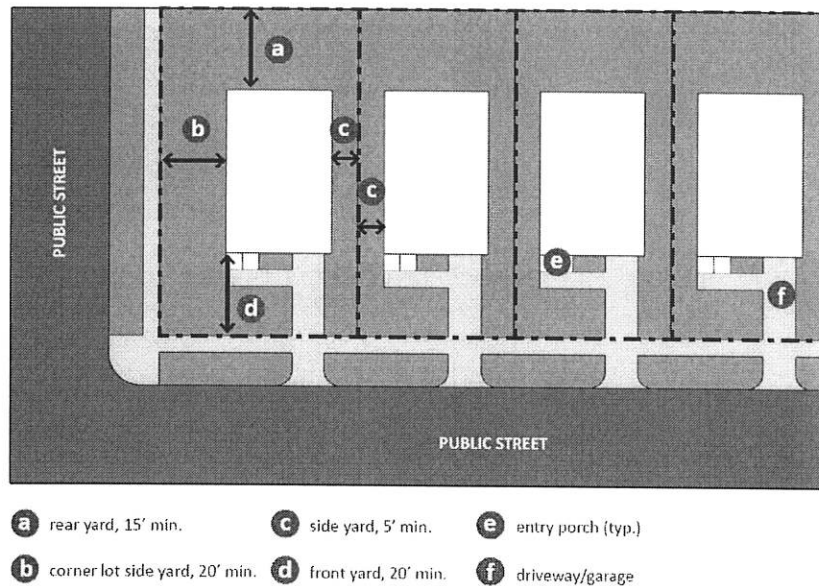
Sample home layout diagram with attached garage at the front of building and street access
